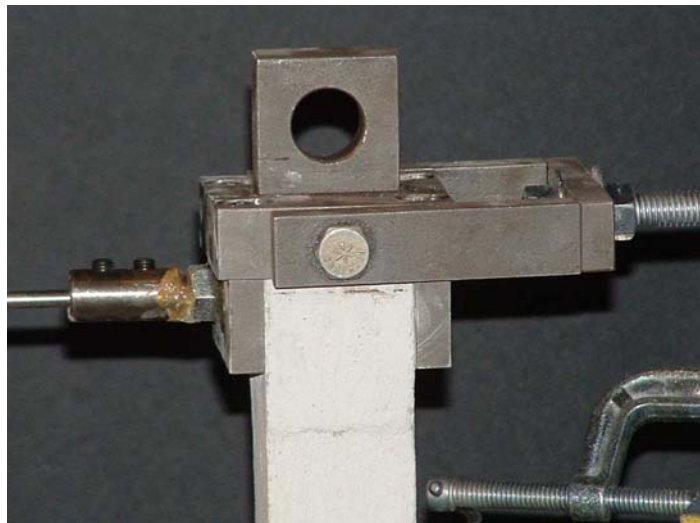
Loading Cap Used for 5-mm R/C DHFRP Columns.
